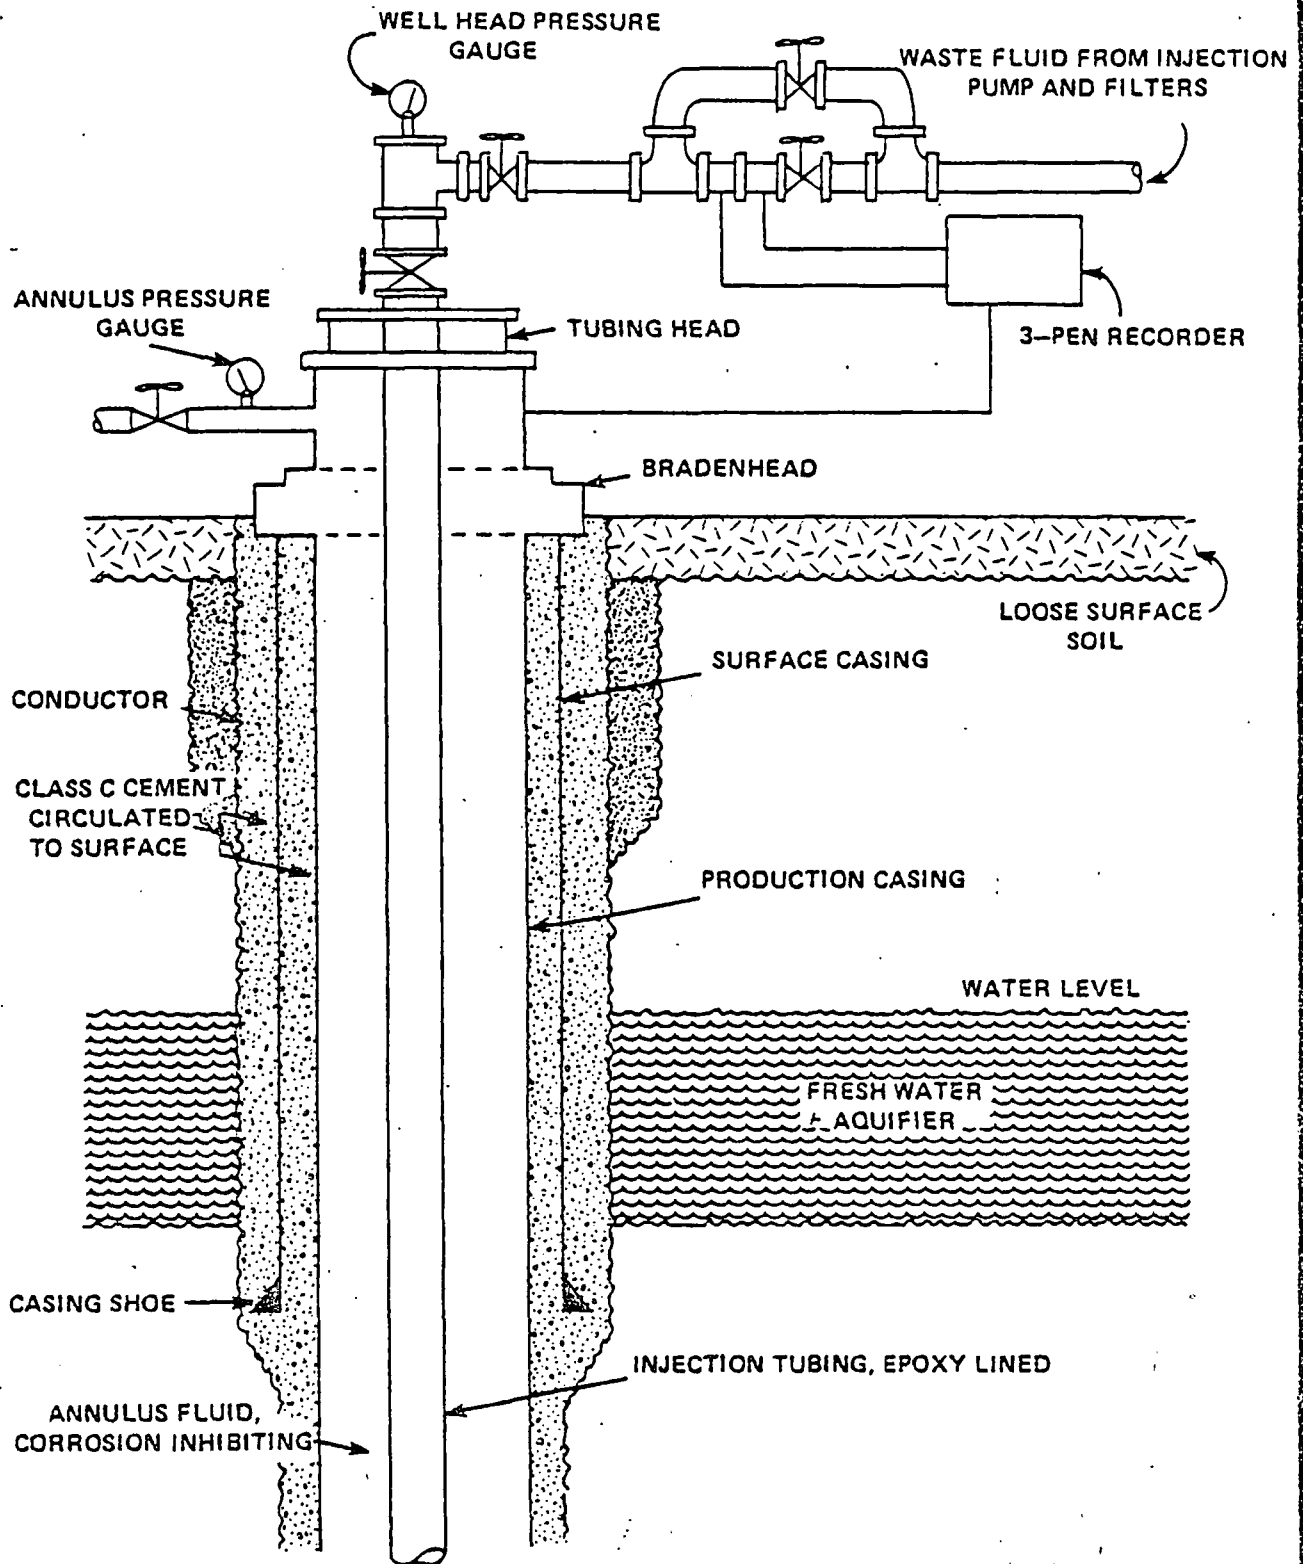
DISPOSAL WELL DESIGN. TYPICAL CASING STRINGS AND WELLHEAD USED IN WASTE-DISPOSAL WELL.
